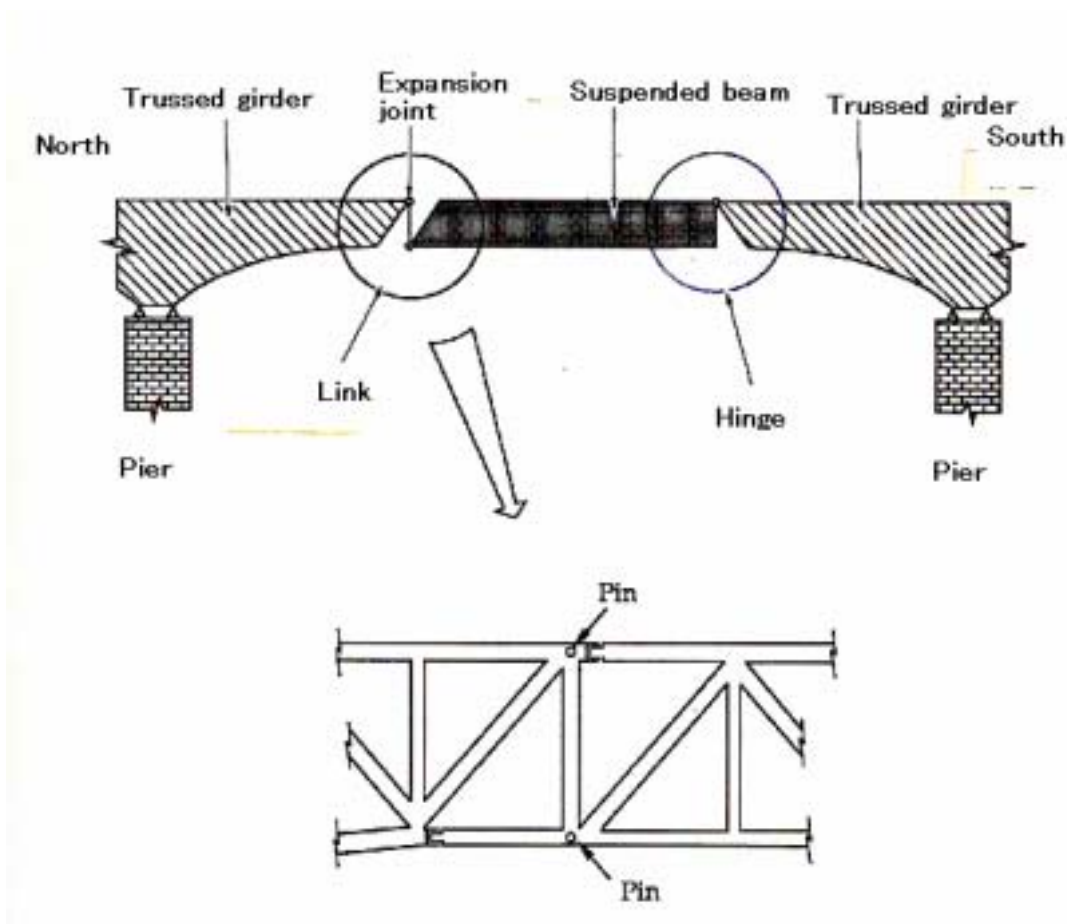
Schematic drawings of structural type of Seongsu Bridge.
